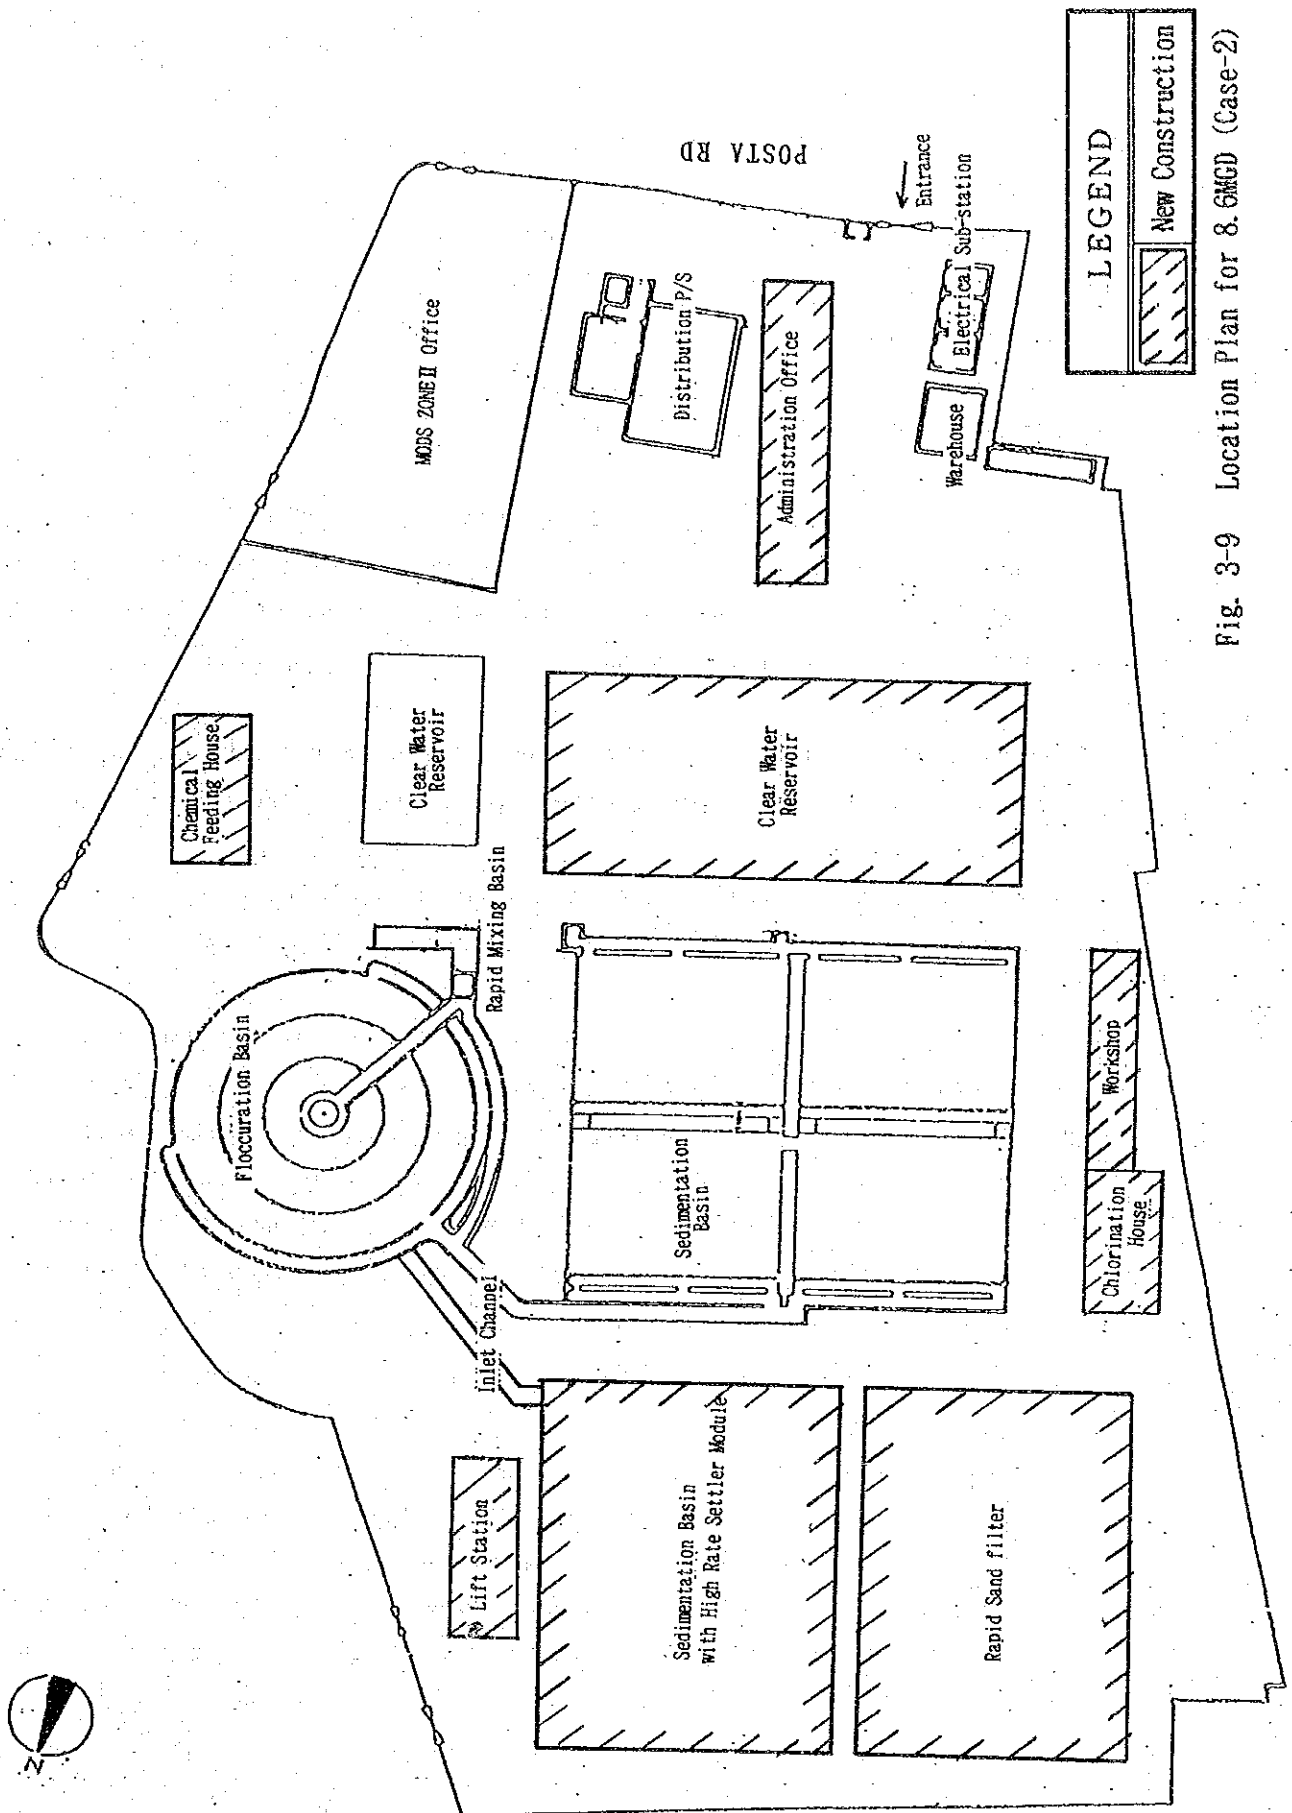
Location Plan for 8.6MGD (Case-2)
